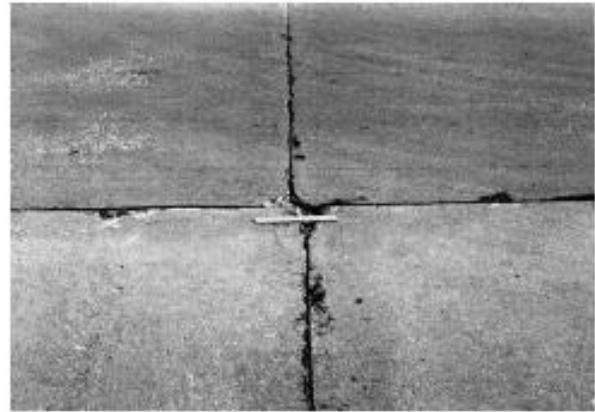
Low-Severity Spalling, Corner
